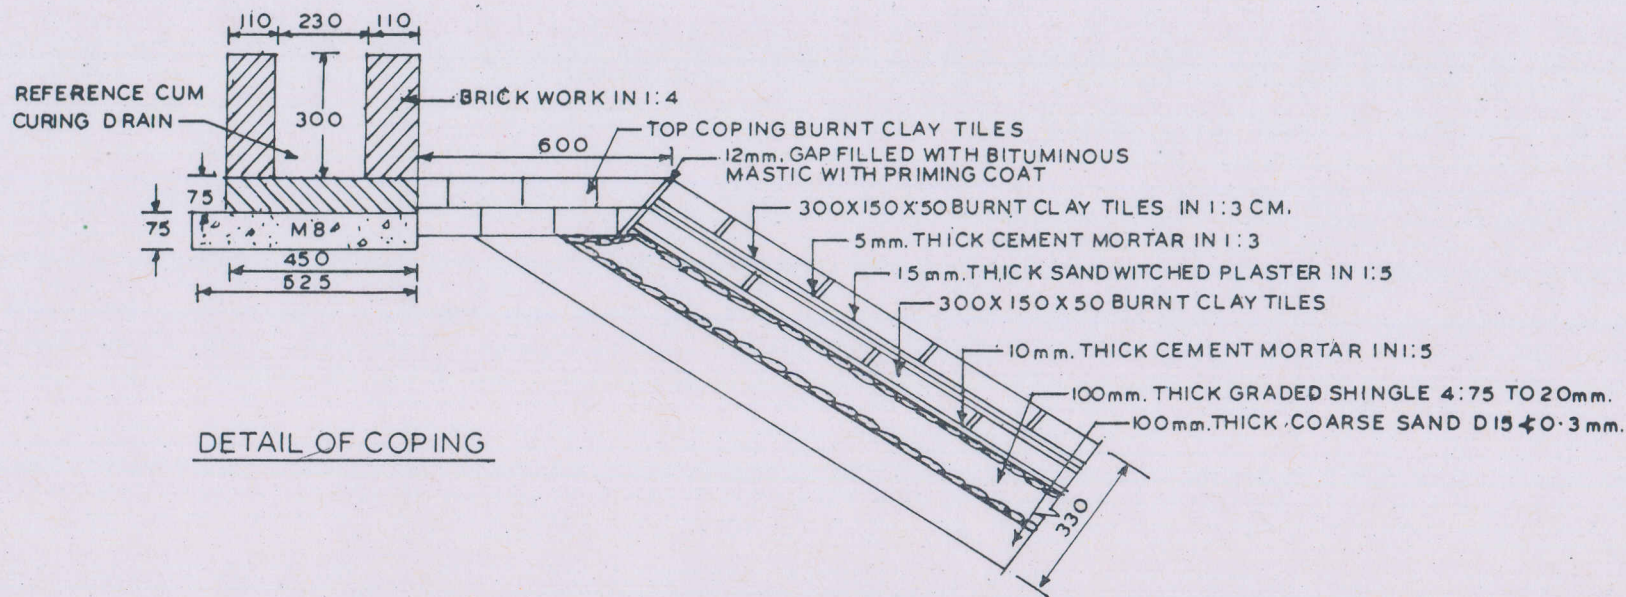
DETAIL OF LINING AND DRAINAGE IN CUTTING-SECTION
